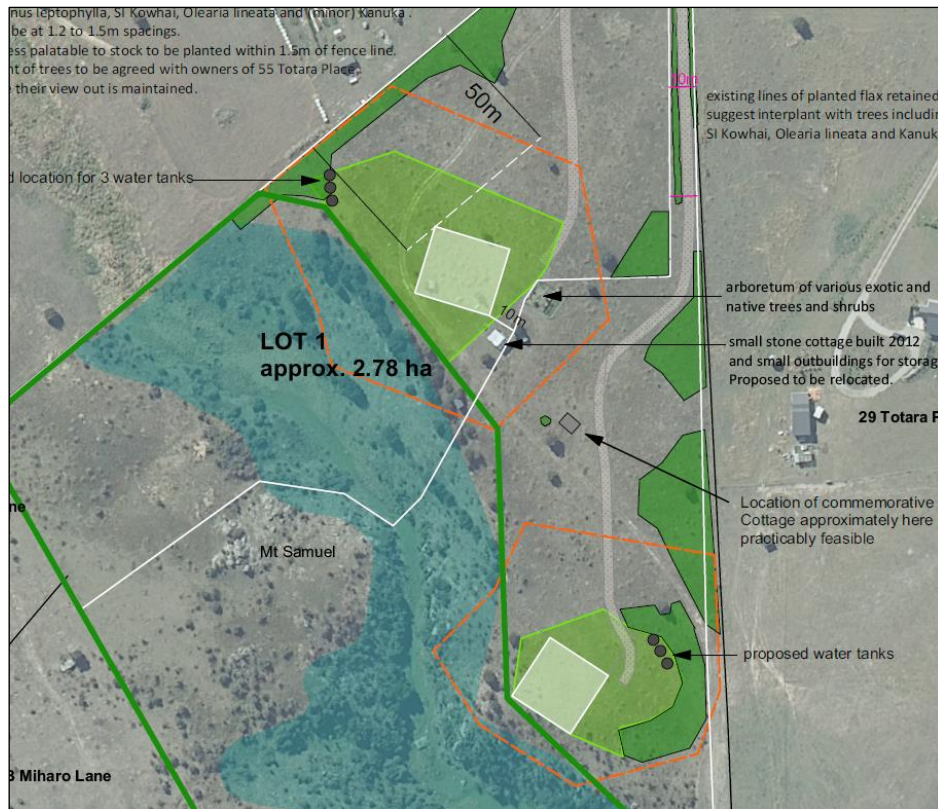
Extract of Landscape Plan showing curtilage area in orange.
